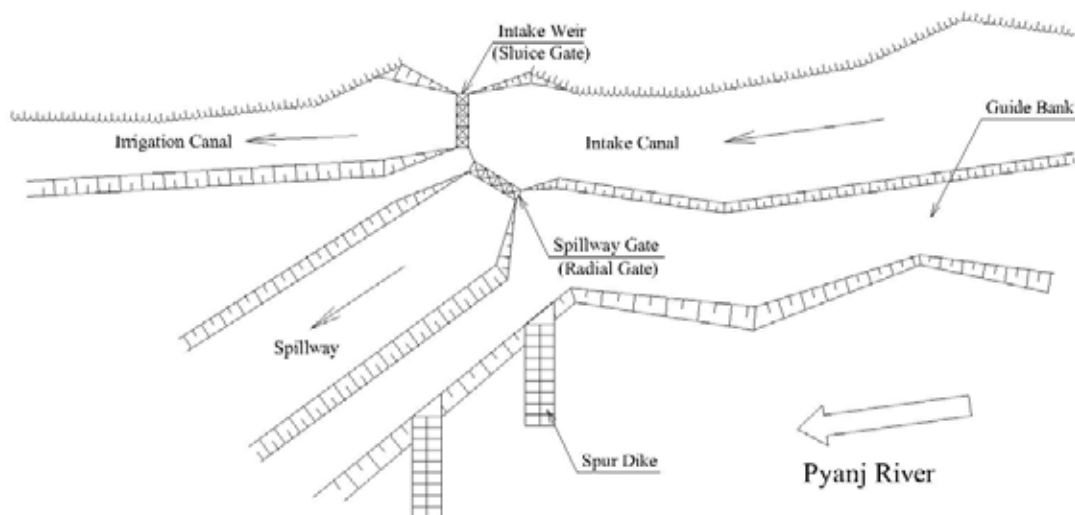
Horizontal Conceptual Plan of Chubek Weir
